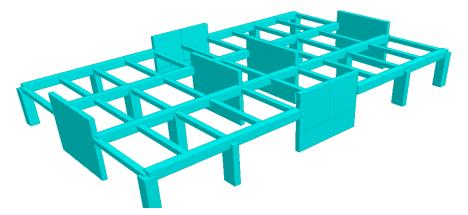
Orthogonal view of single floor of RC frame with Shear Wall in STAAD
